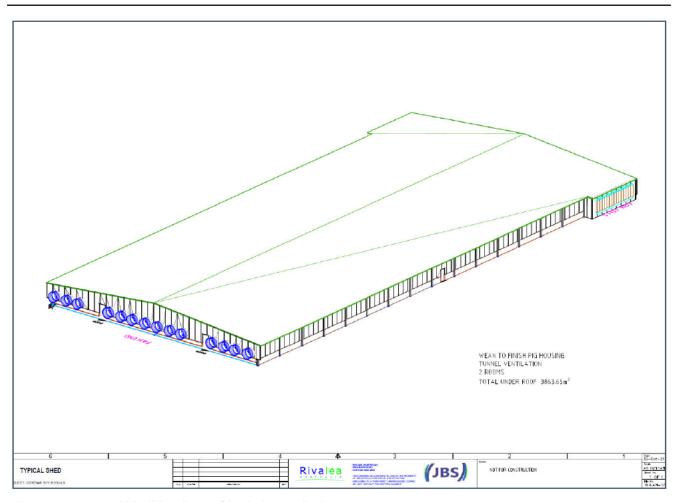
Proposed Modification to Shed Plans (Rivalea, 2024)
